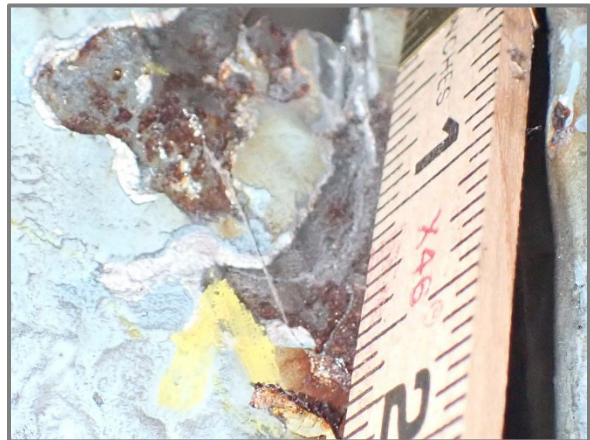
Floorbeam 9 in Span 2 bottom 3/8" long crack in the rear top web cope at the Left Truss after grinding and magnetic particle testing. Note crack has propagated 3/8" since previous inspection.
